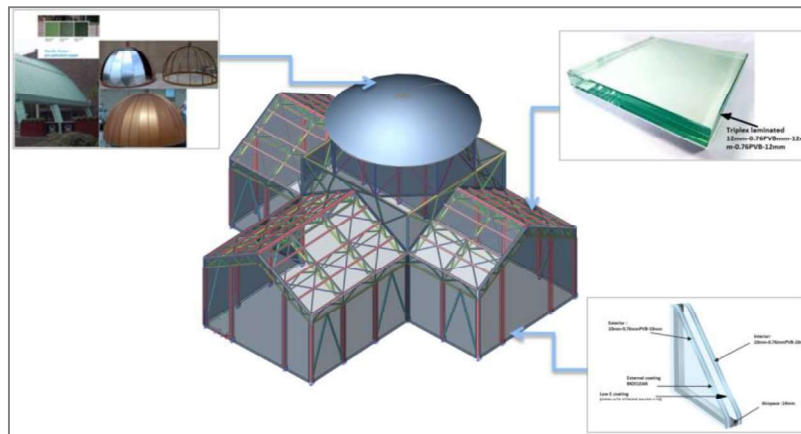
On the 3D model of the case study (Orthodox Church with glass shell elements).
